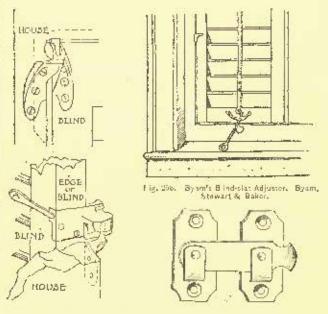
Automatic Blind-swning Fixtures: F. O. North & Co.
